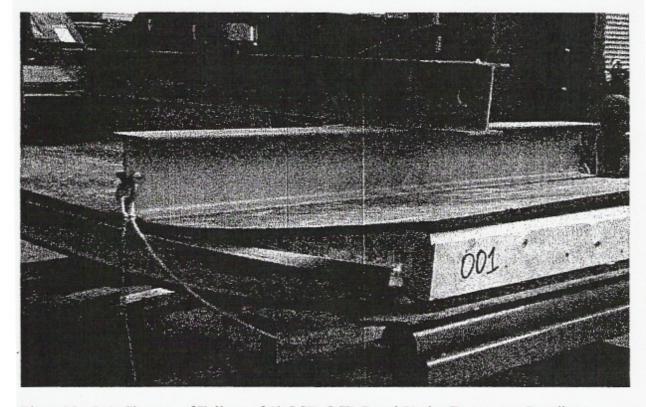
Closeup of Failure of 8' OSB-OSB Panel Under Transverse Loading
